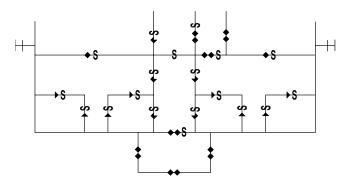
(b) Symbol used to note wall ratings on design and construction documents.
